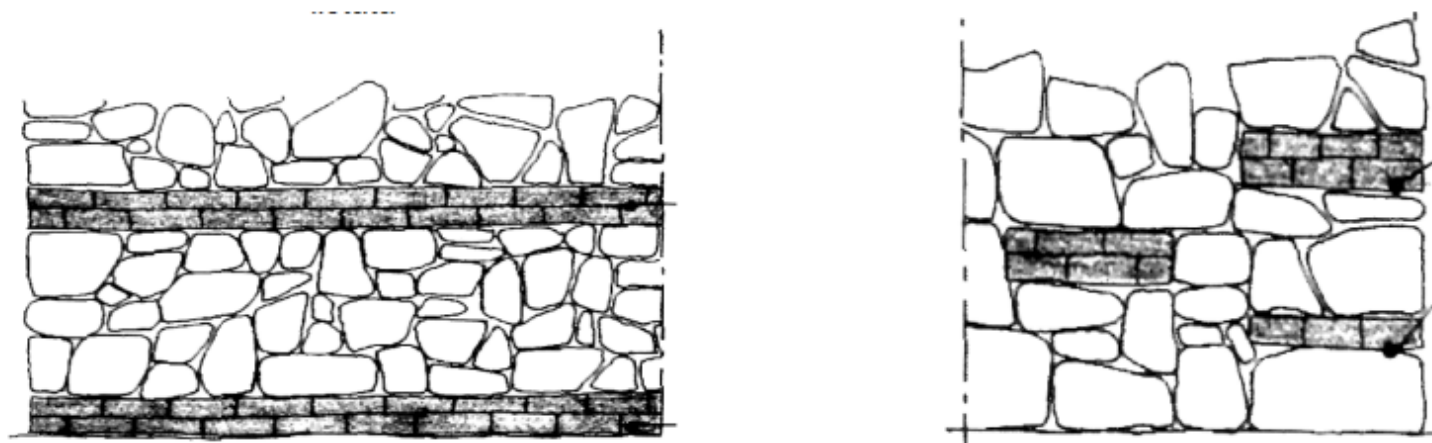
Two examples of masonry with a mix of stones and bricks. *a)* edged masonry; *b)* mixed masonry with bricks.
